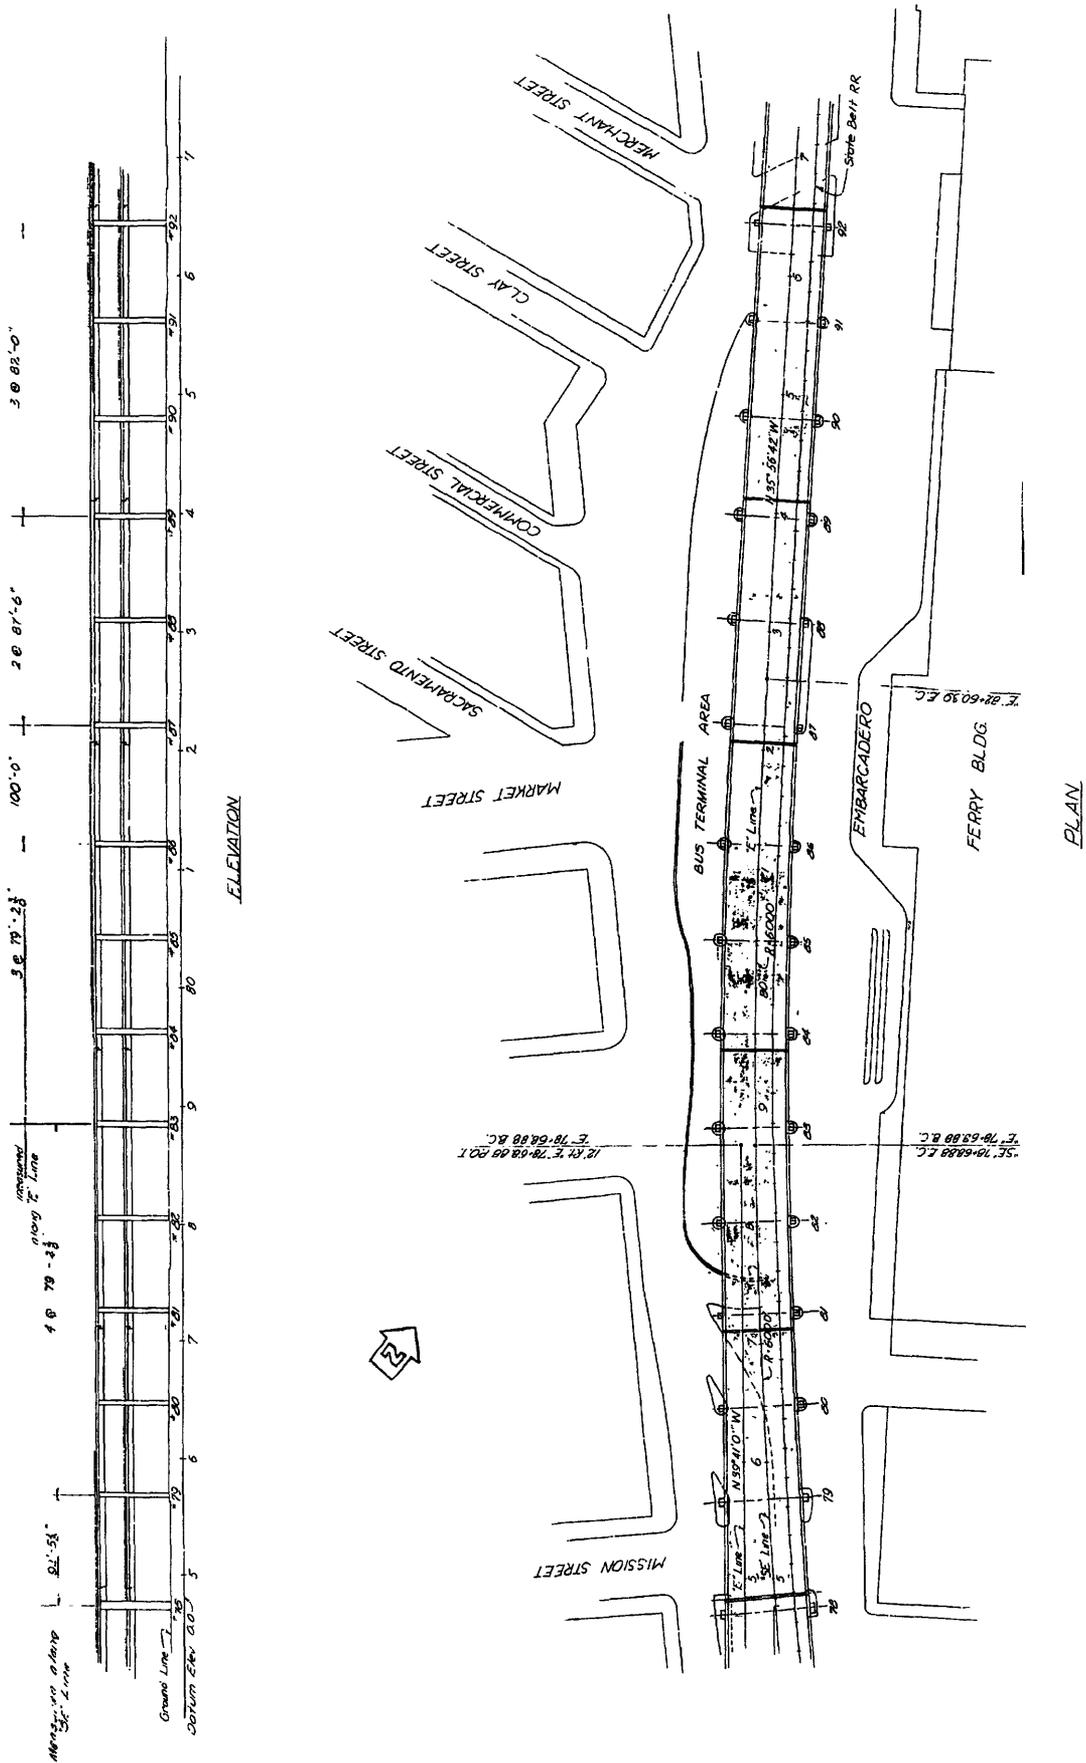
Structural Plan drawing for Embarcadero Viaduct.
